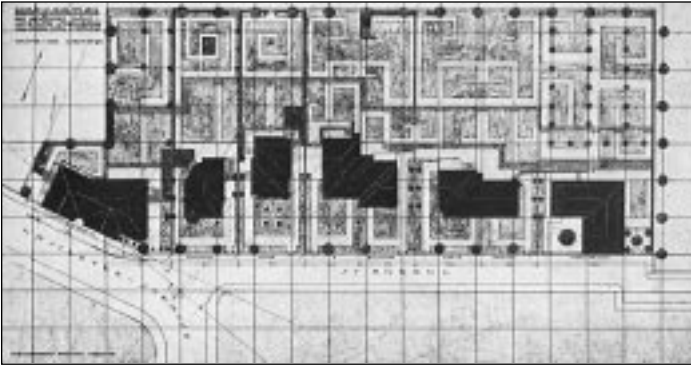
J.L.M. Lauweriks, Hohenhagen artists colony, 1910-1914, Stirnband site plan.
